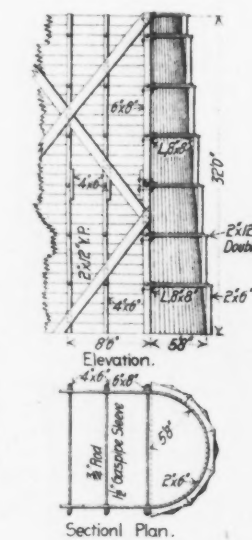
MOLD OR FORM FOR CONCRETE PIER.
